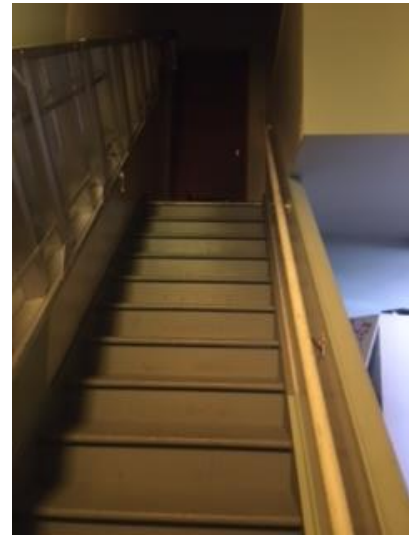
Stairway to Storage Area over Original Church (Hall) Entrance
